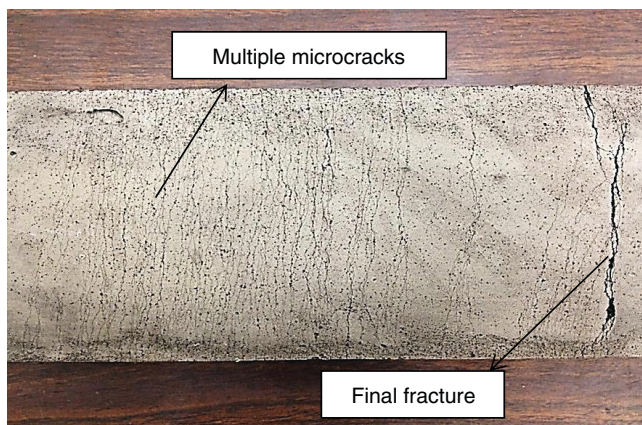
Typical crack patterns in LMES-ECC specimens after bending test.
